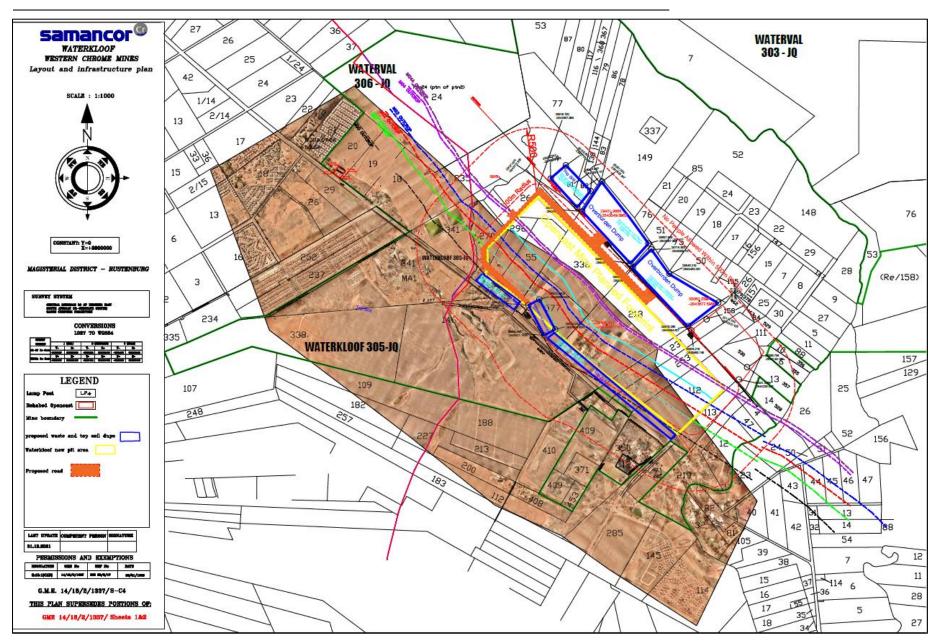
Proposed layout plan of the Millsell and Waterkloof Opencast Mine Elemental Sustainability (Pty) Ltd.
